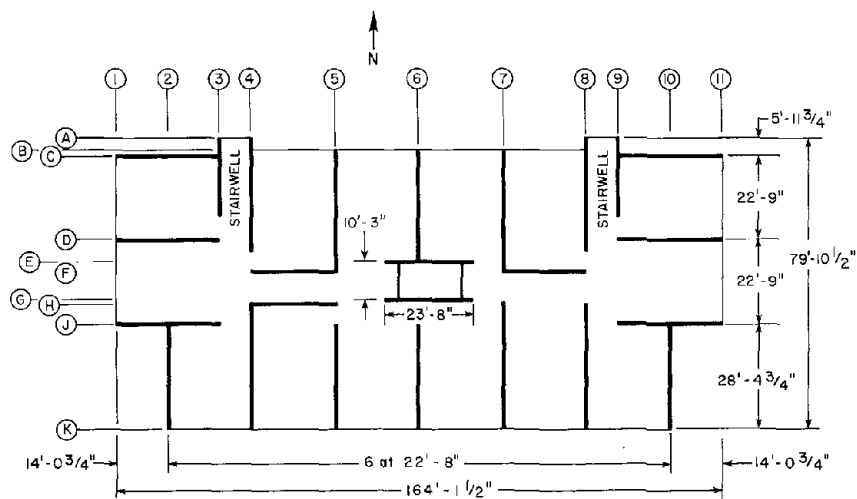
TYPICAL FLOOR PLAN - 2ND THRU 12TH FLOORS
